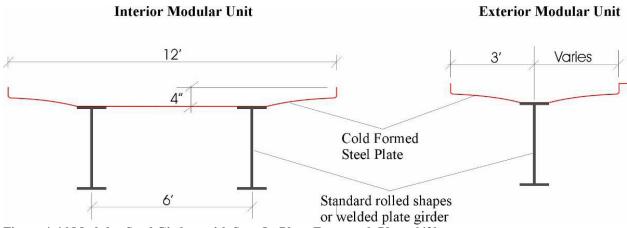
Modular Steel Girders with Stay-In-Place Formwork Plates [42]
